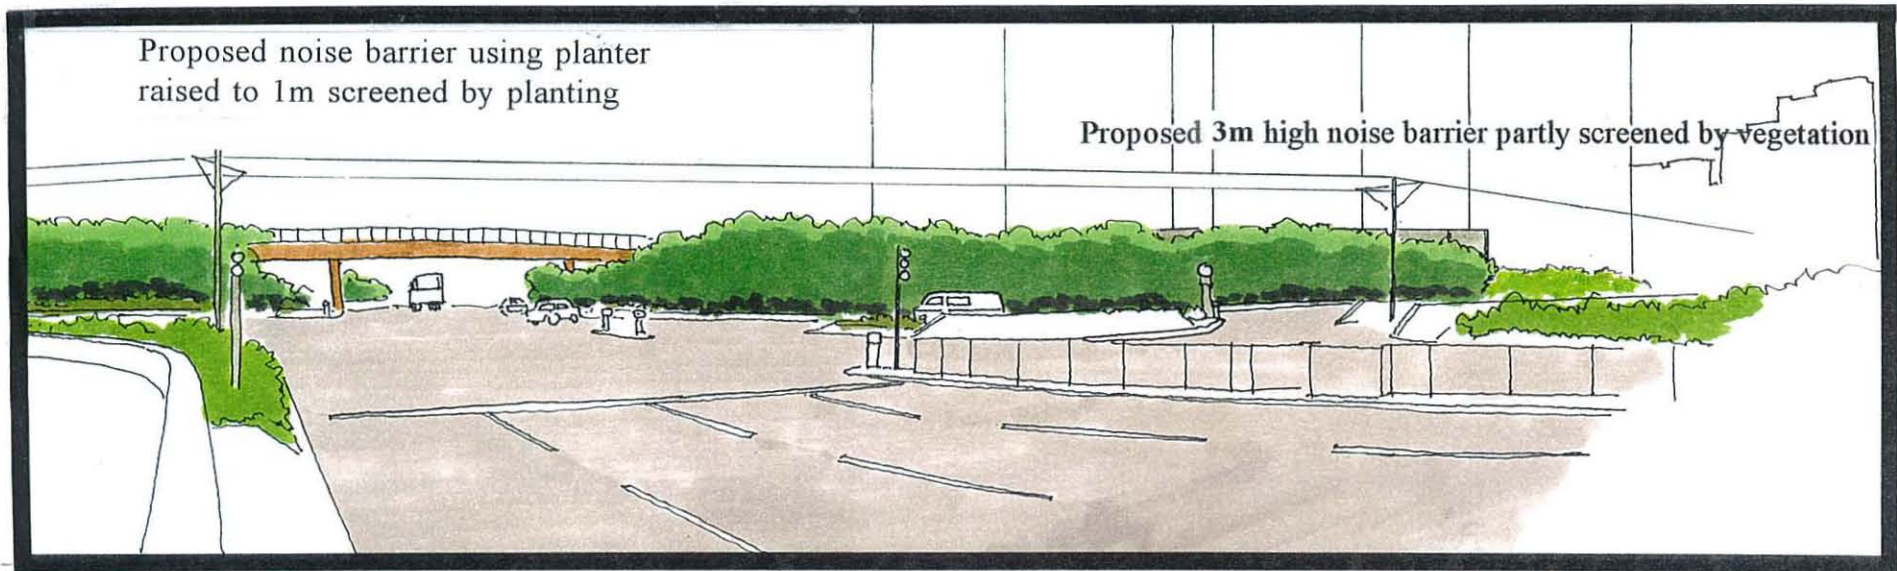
View of the proposed noise barrier along Tin Yiu Road
